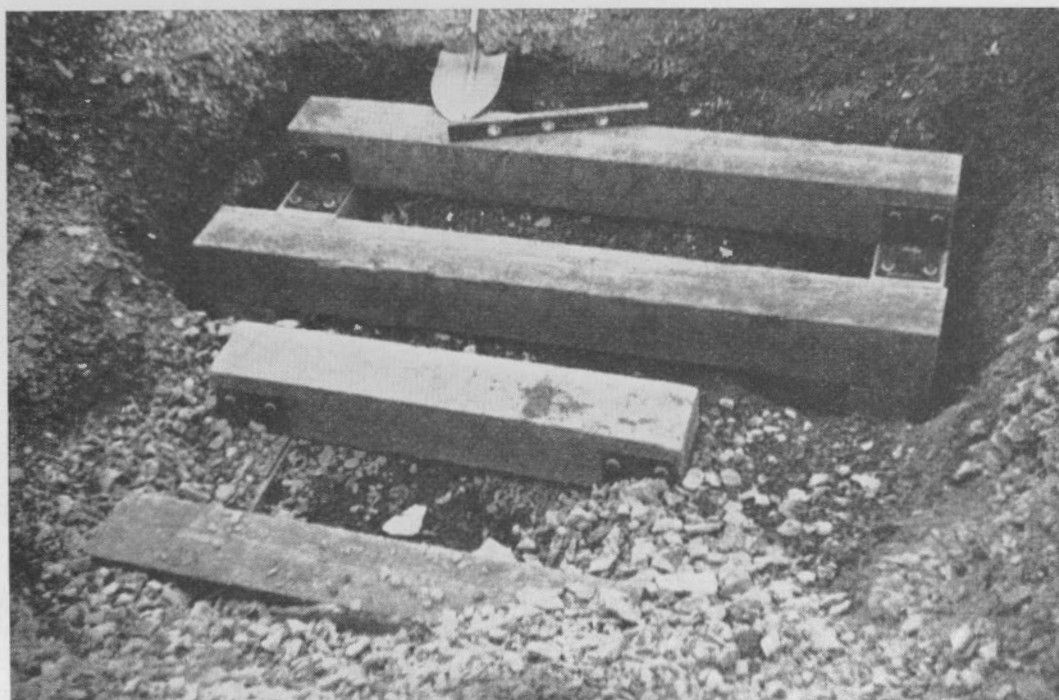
Timber cribbing, set in permafrost, to provide foundations for recording tables.
